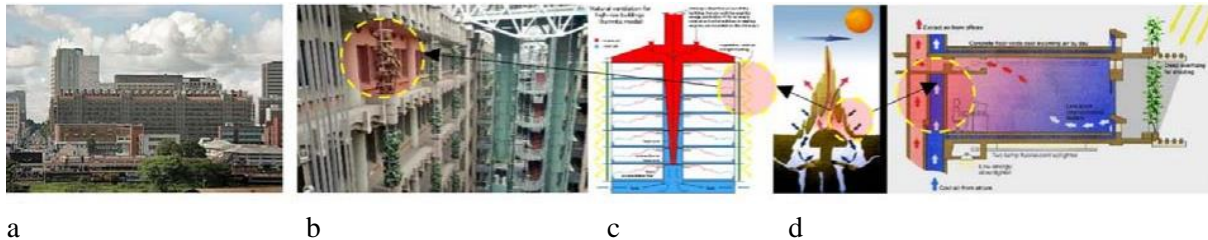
Eastgate building biomimetic concept. a) Eastgate building. b) Eastgate building facade. Source of a and b: (URL-3). C) Eastgate building section. Source: (URL-4). d) inspiration of Eastgate building skin. (URL-5).
